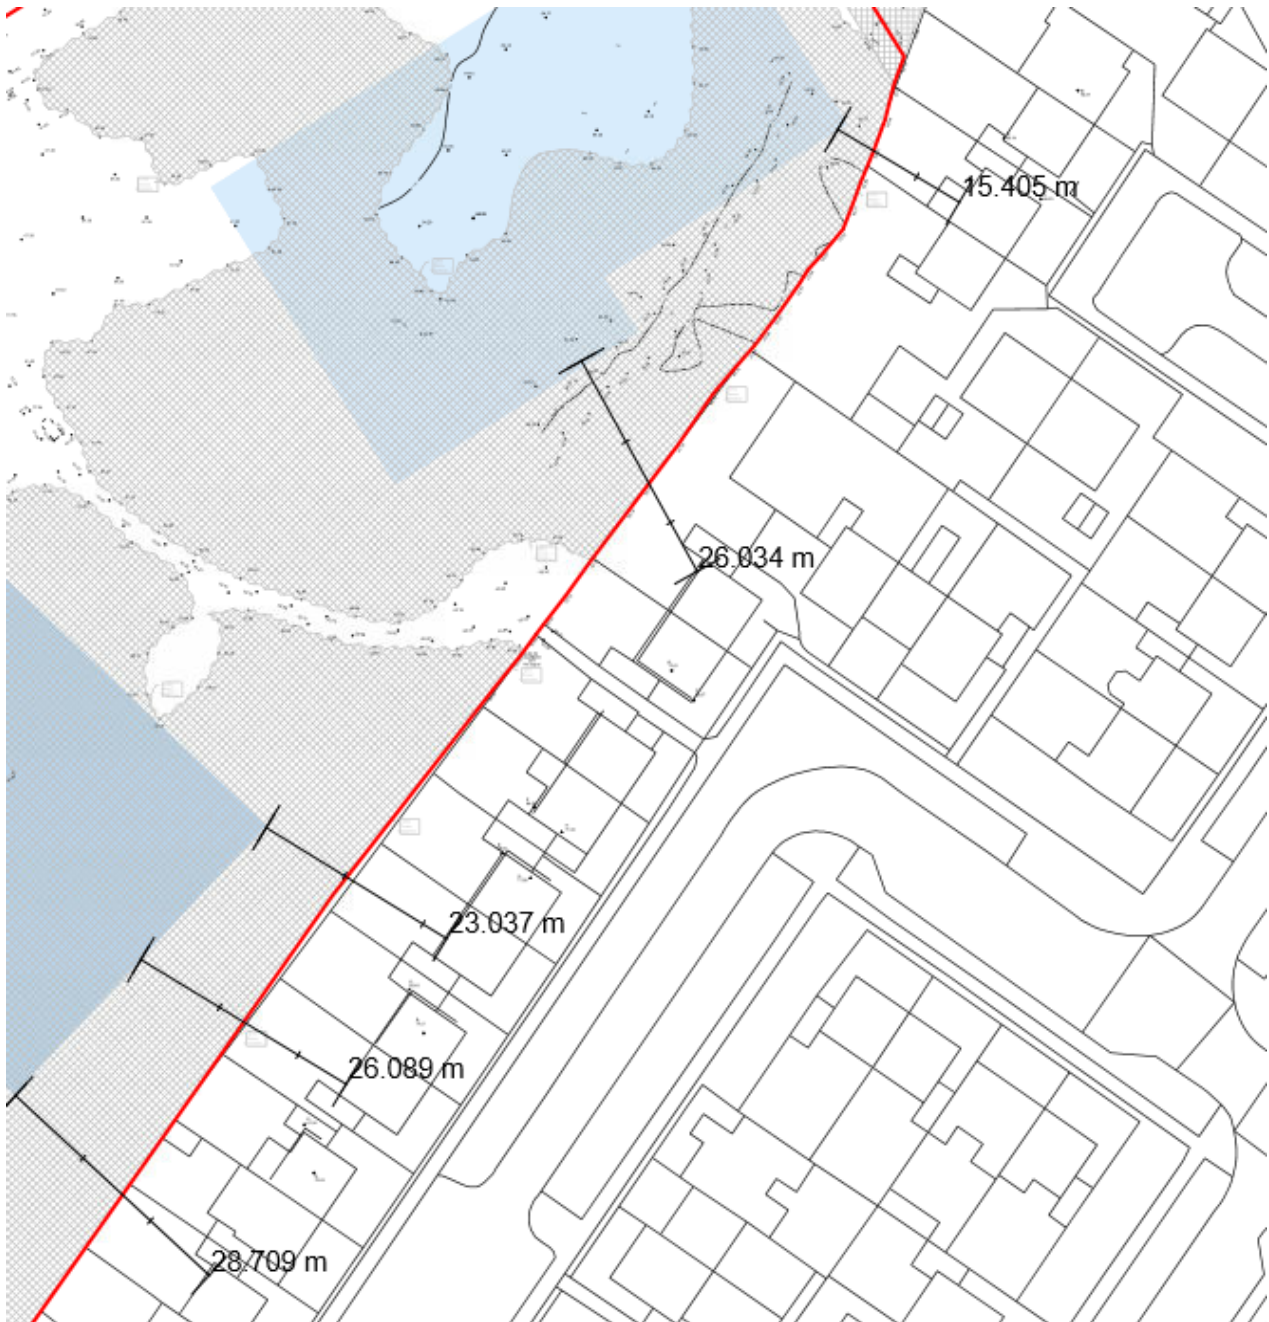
Distances between the indicative footprint of the proposed buildings and adjacent housing.
